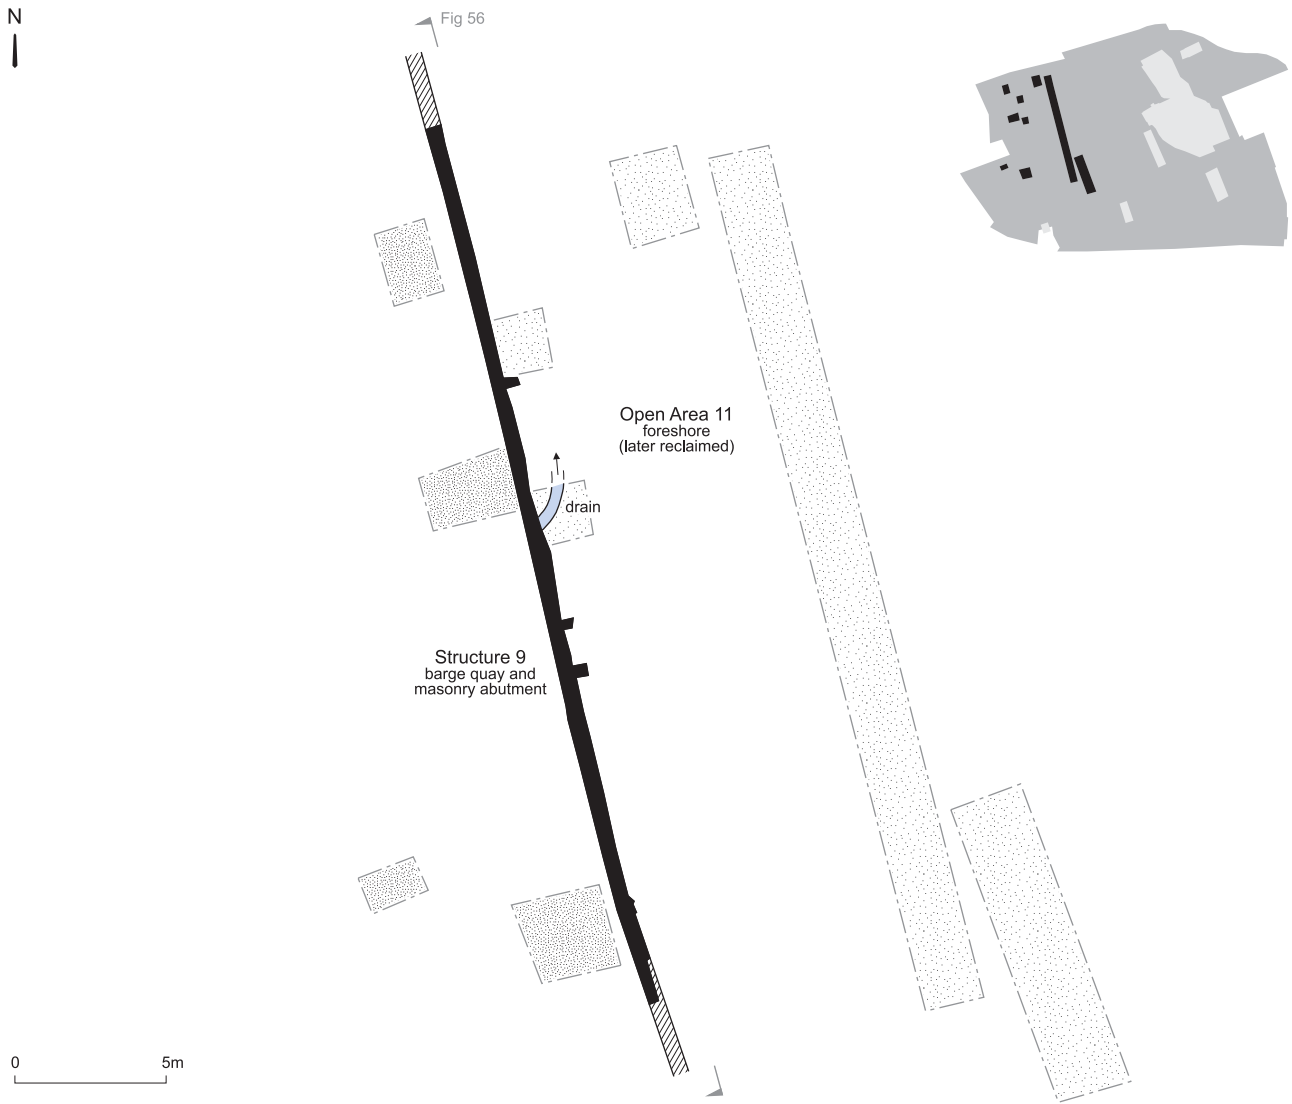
Plan of the barge quay and masonry abutment (S9) of the new Welsh Bridge and the river foreshore (OA11), period 6 (scale 1:250)
